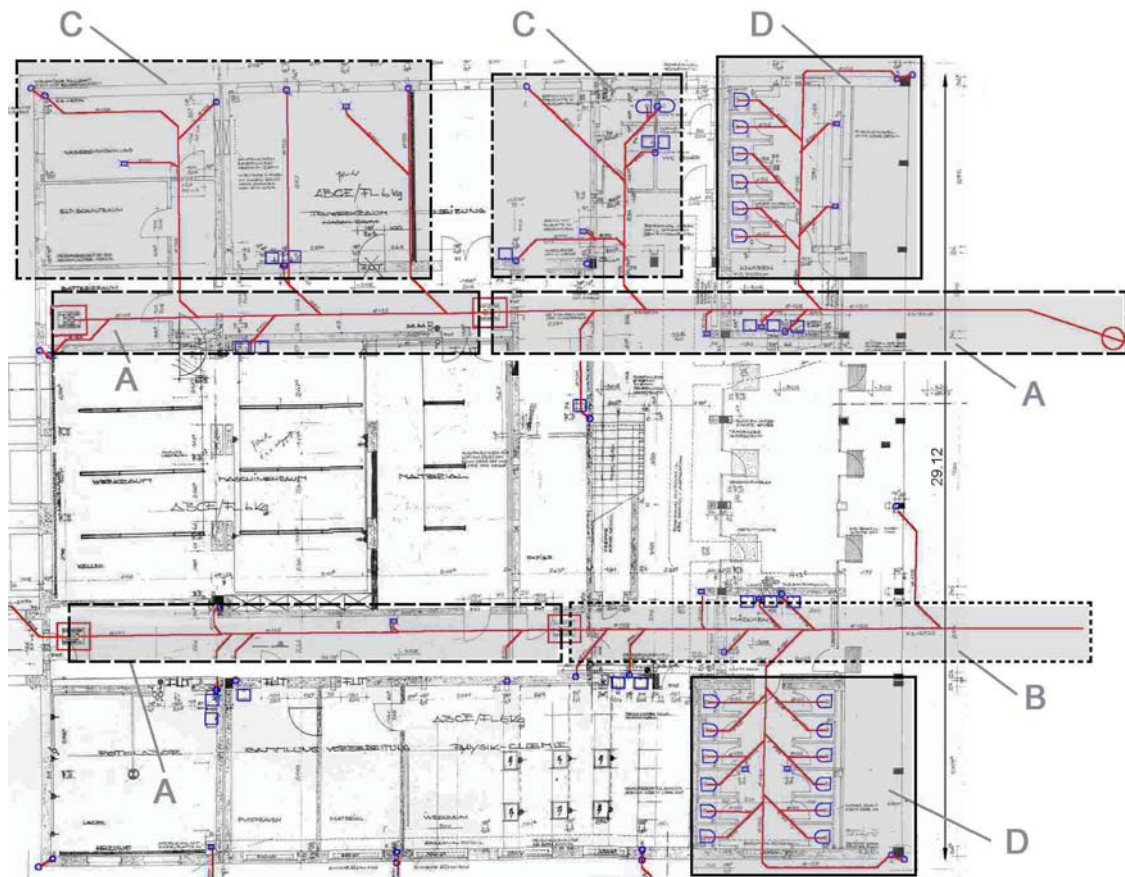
Example of the subdivision of the drainage system of a building into system types [11]
